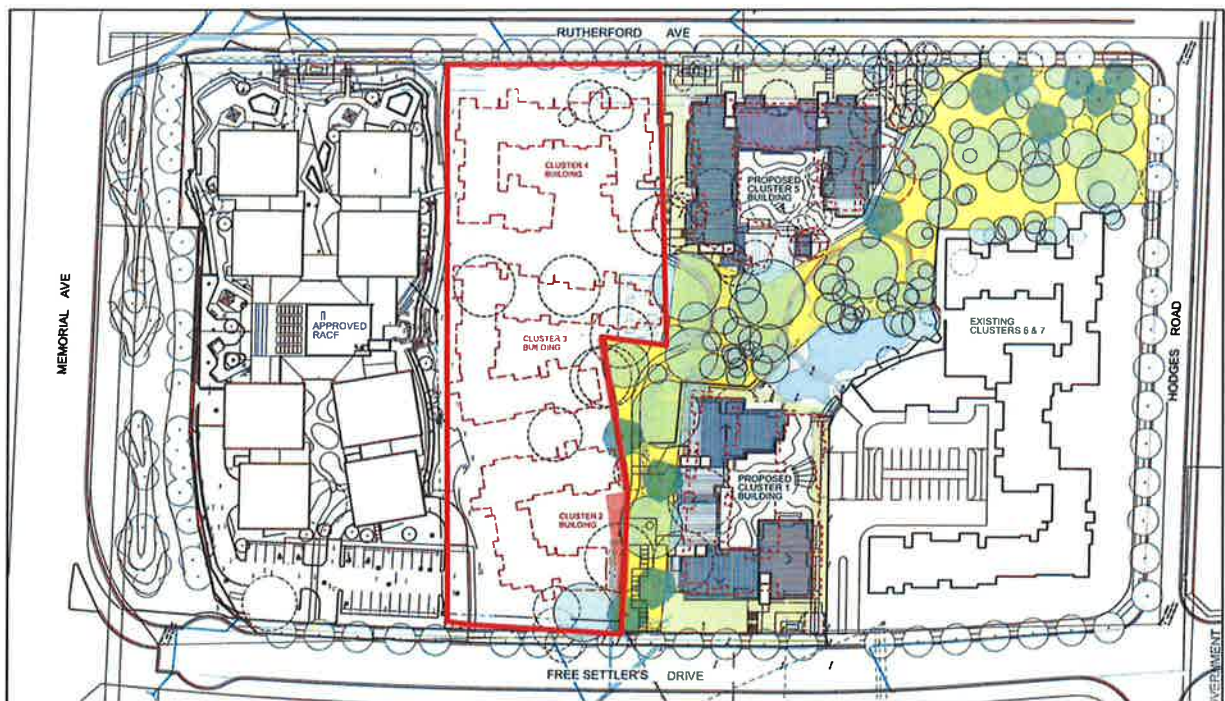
Approved site plans with clusters 2, 3 and 4 outlined in red (base image source: approved plans Modification 6)
